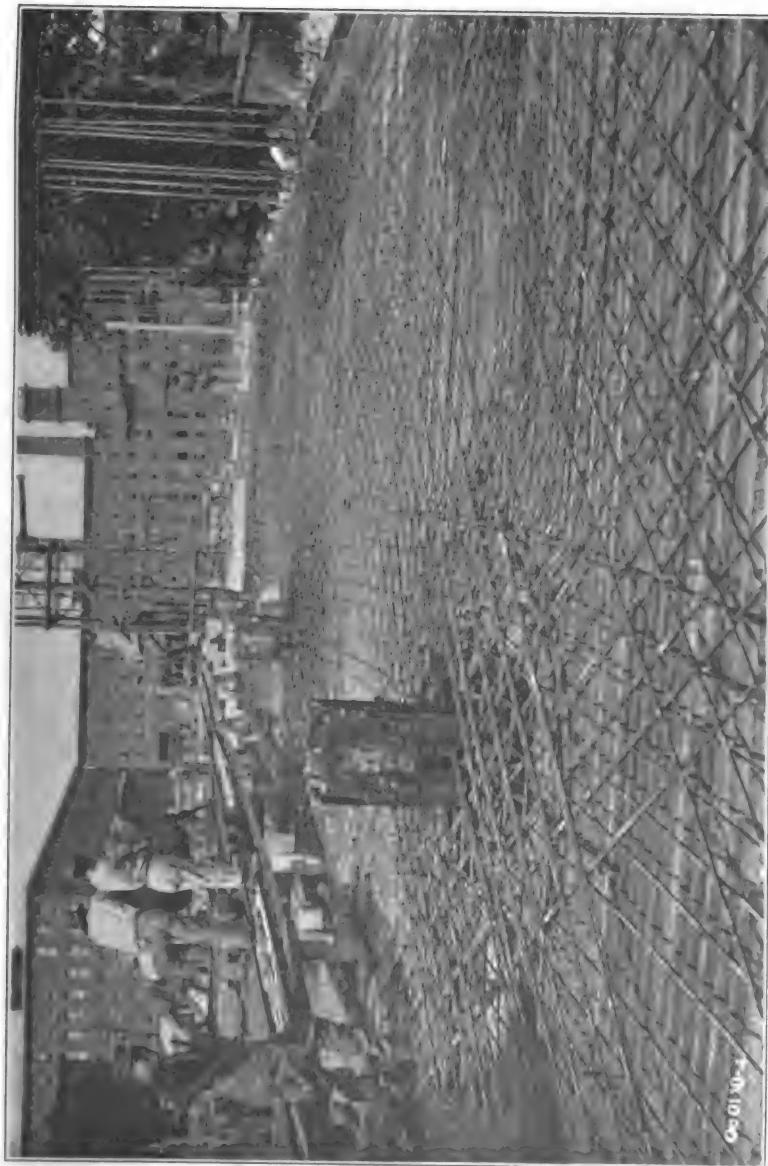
Mushroom floor with steel columns. Massachusetts Cotton Mills, Lowell, Mass.
